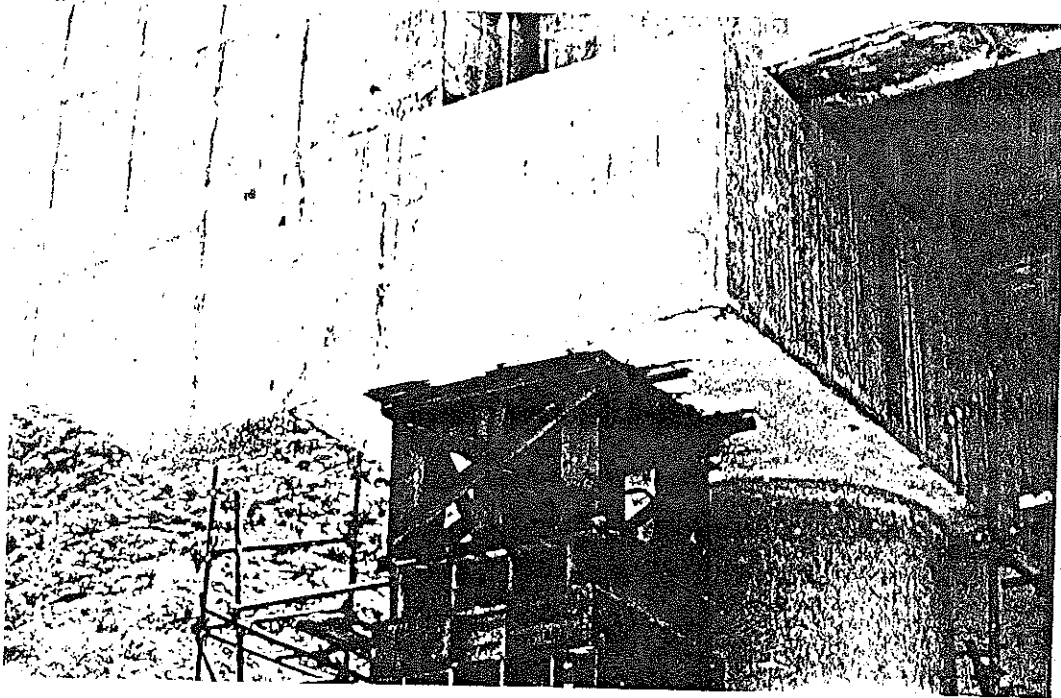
ANOTHER VIEW OF STEEL COLUMN UNDER THE PIER CAP
